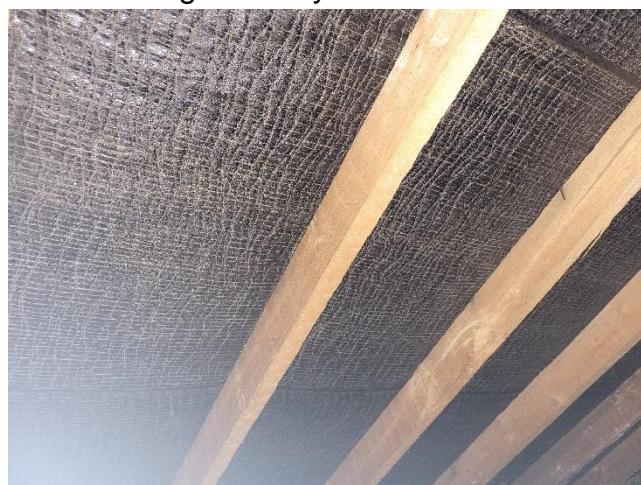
View of the roofing underlay between the rafters and the roof tiles
